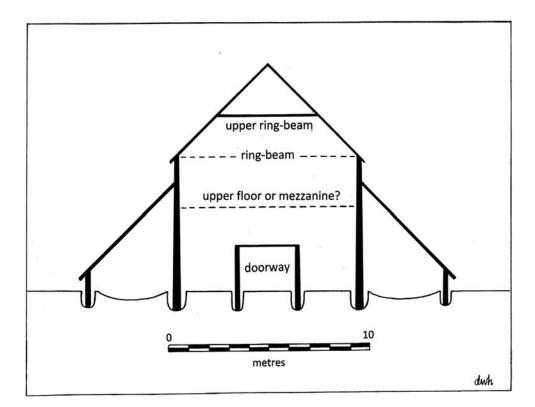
Elevation drawing of split-roof round-house, based on Culduthel ring-ditch House 4 Source: Drawing by D. W. Harding.
